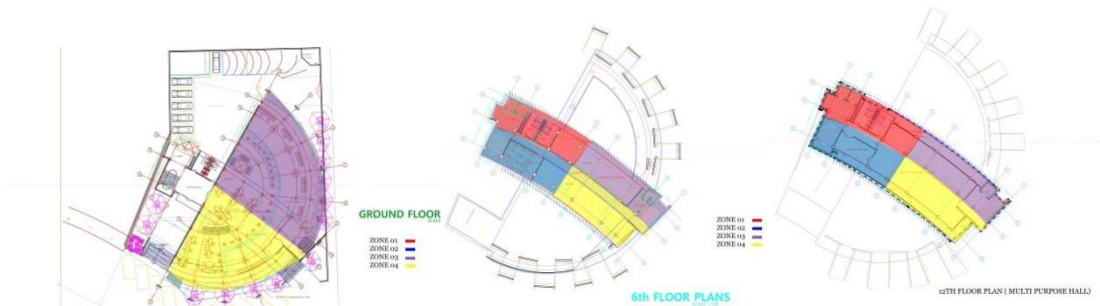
Hidasse Sample Building plan divided into four zones per floor.
